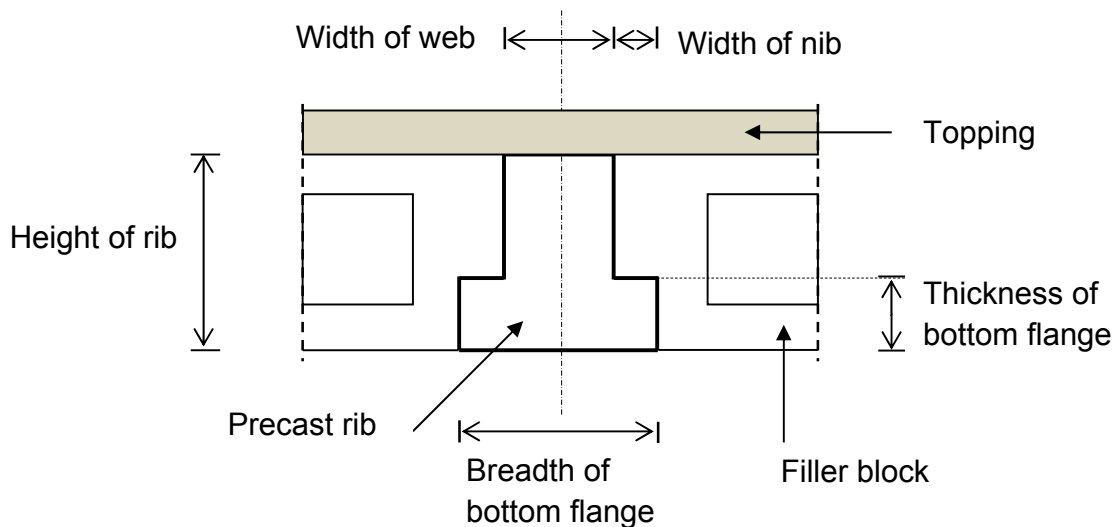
Beam and block slab system using precast inverted T-section rib
